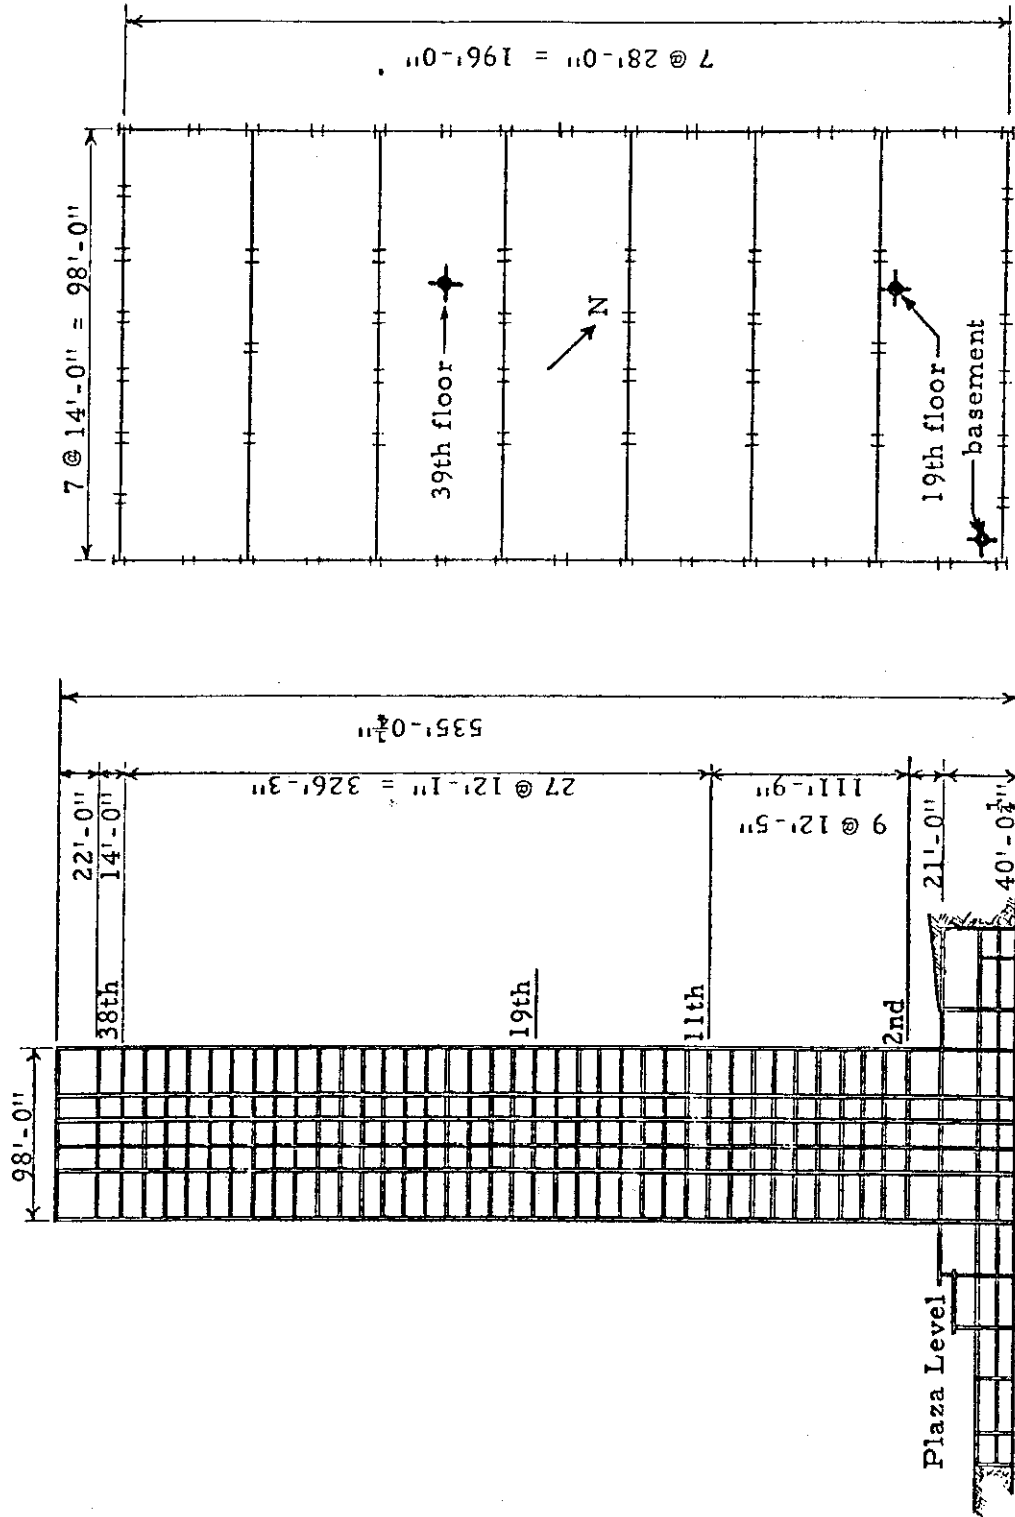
Transverse section and typical floor plan of the Union Bank building (from [9]).
